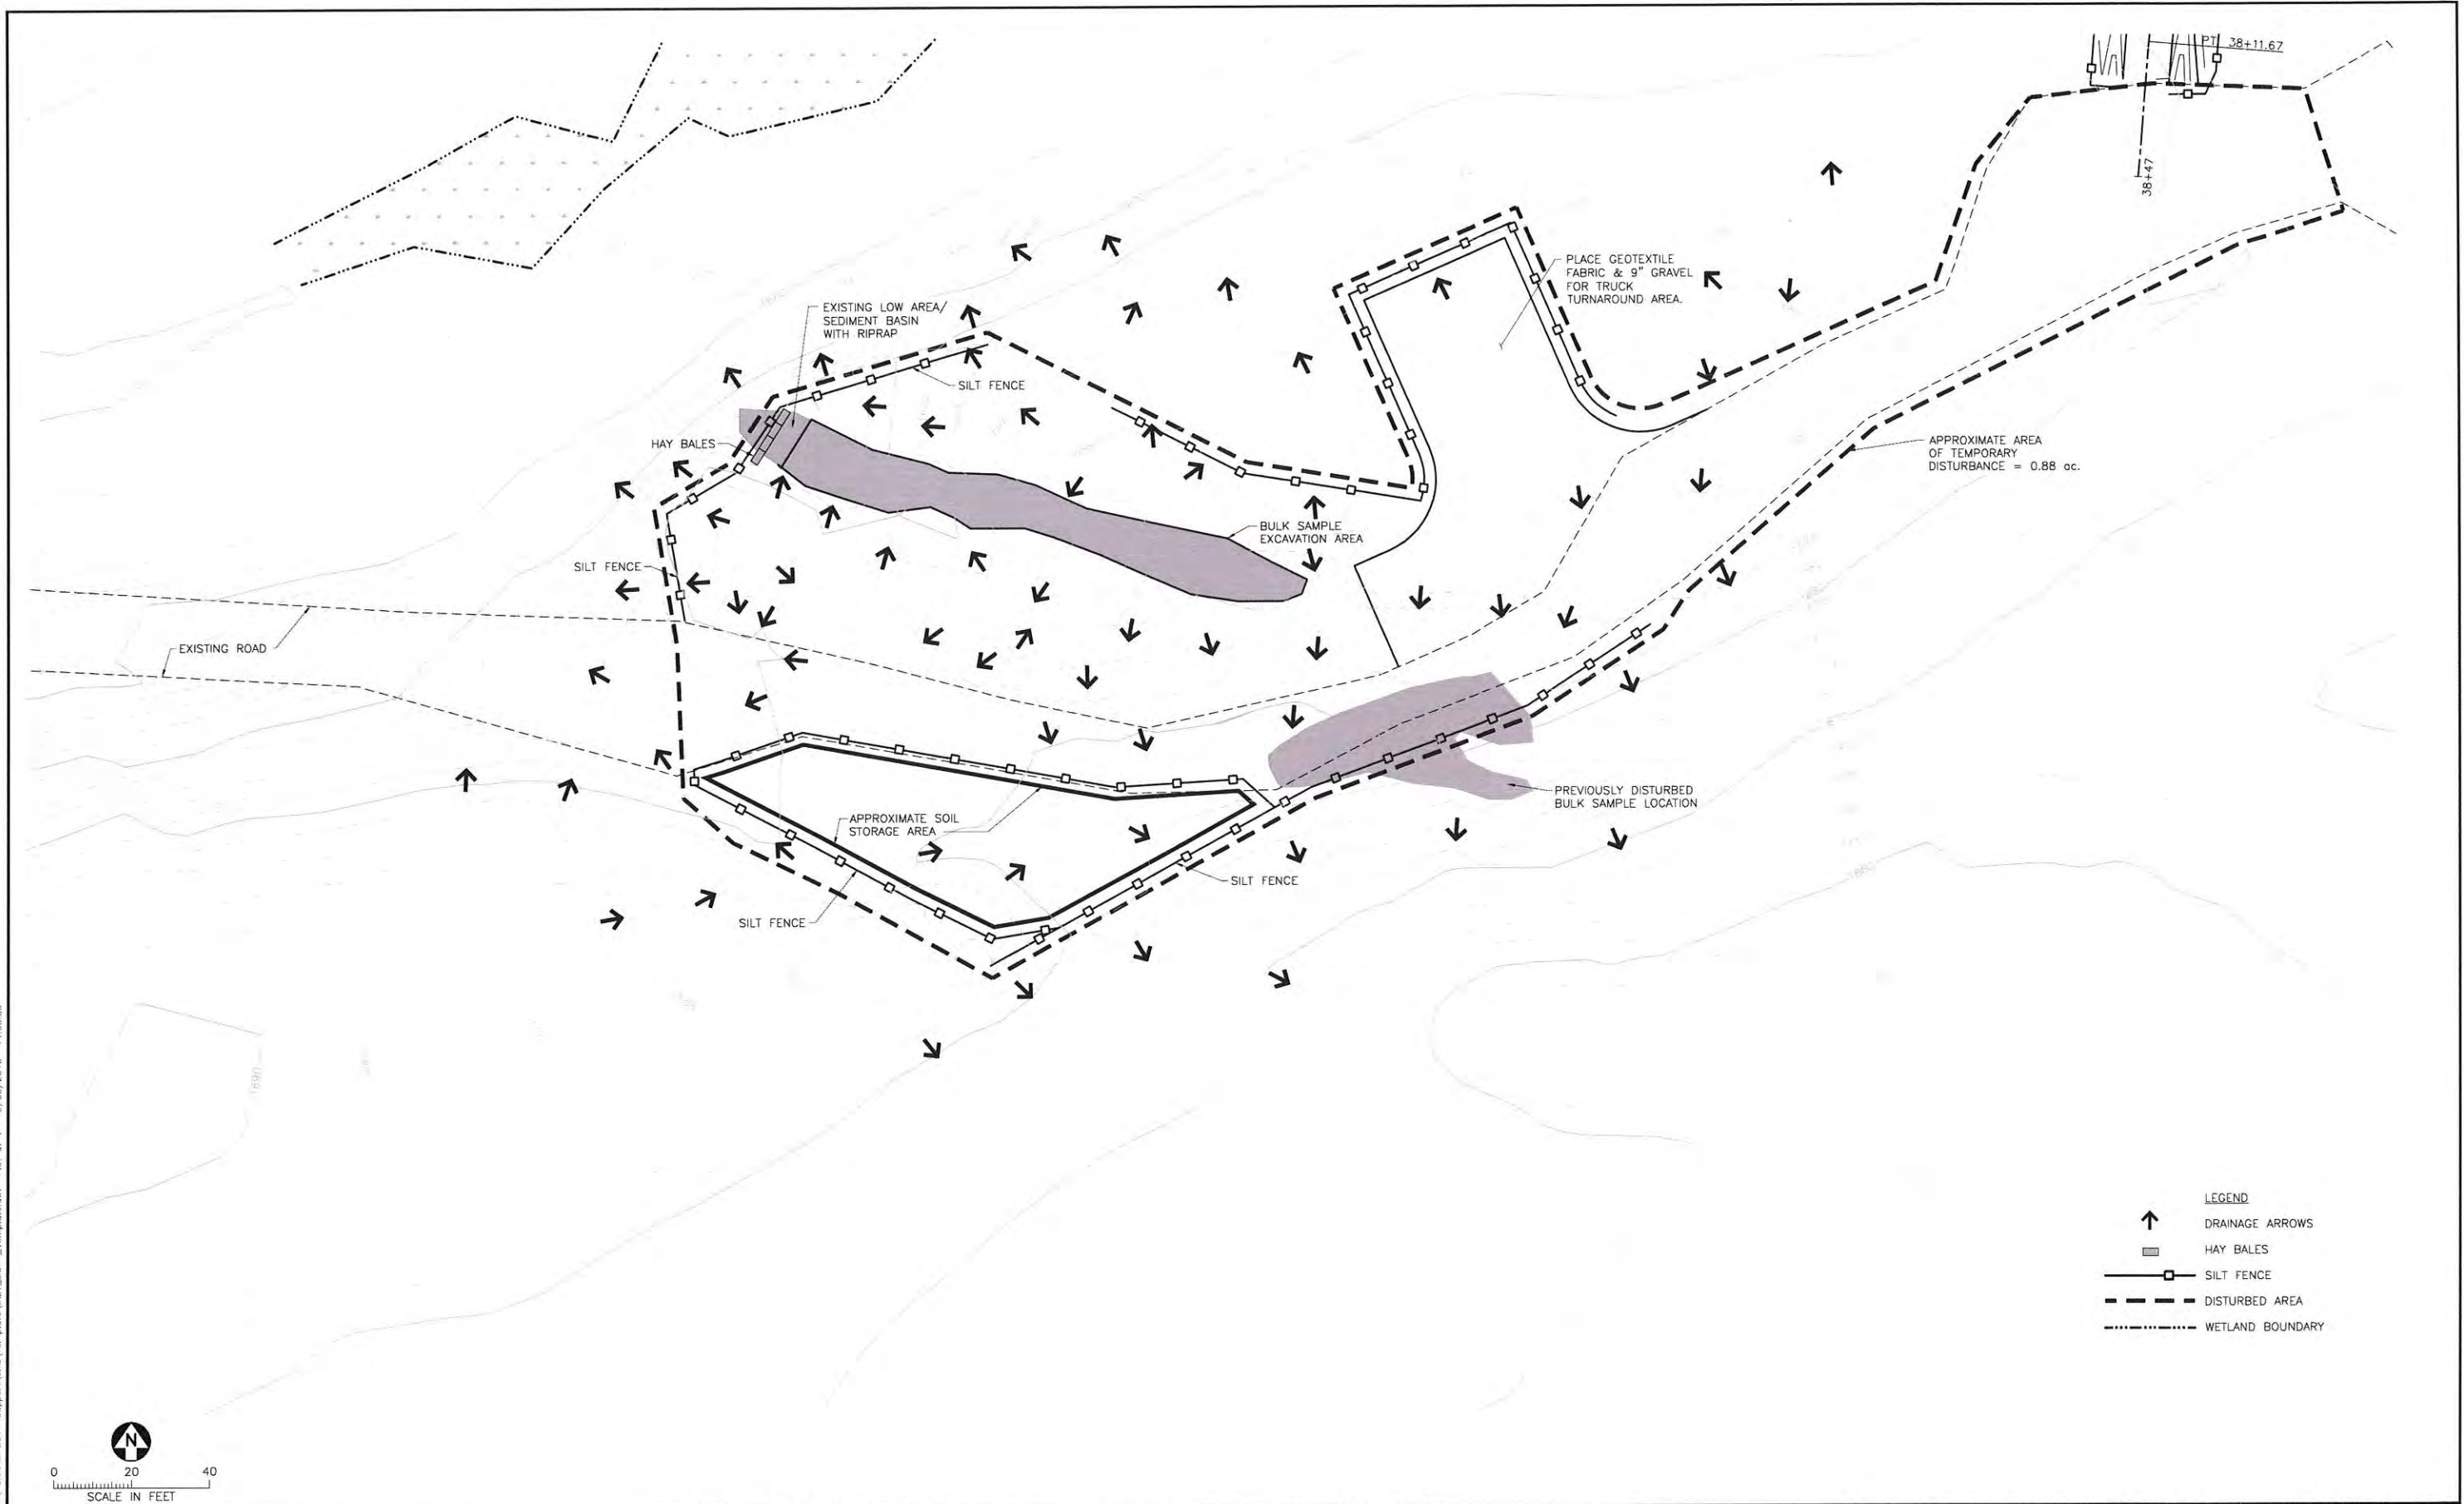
Material Staging Area Erosion and Sediment Control Plan
